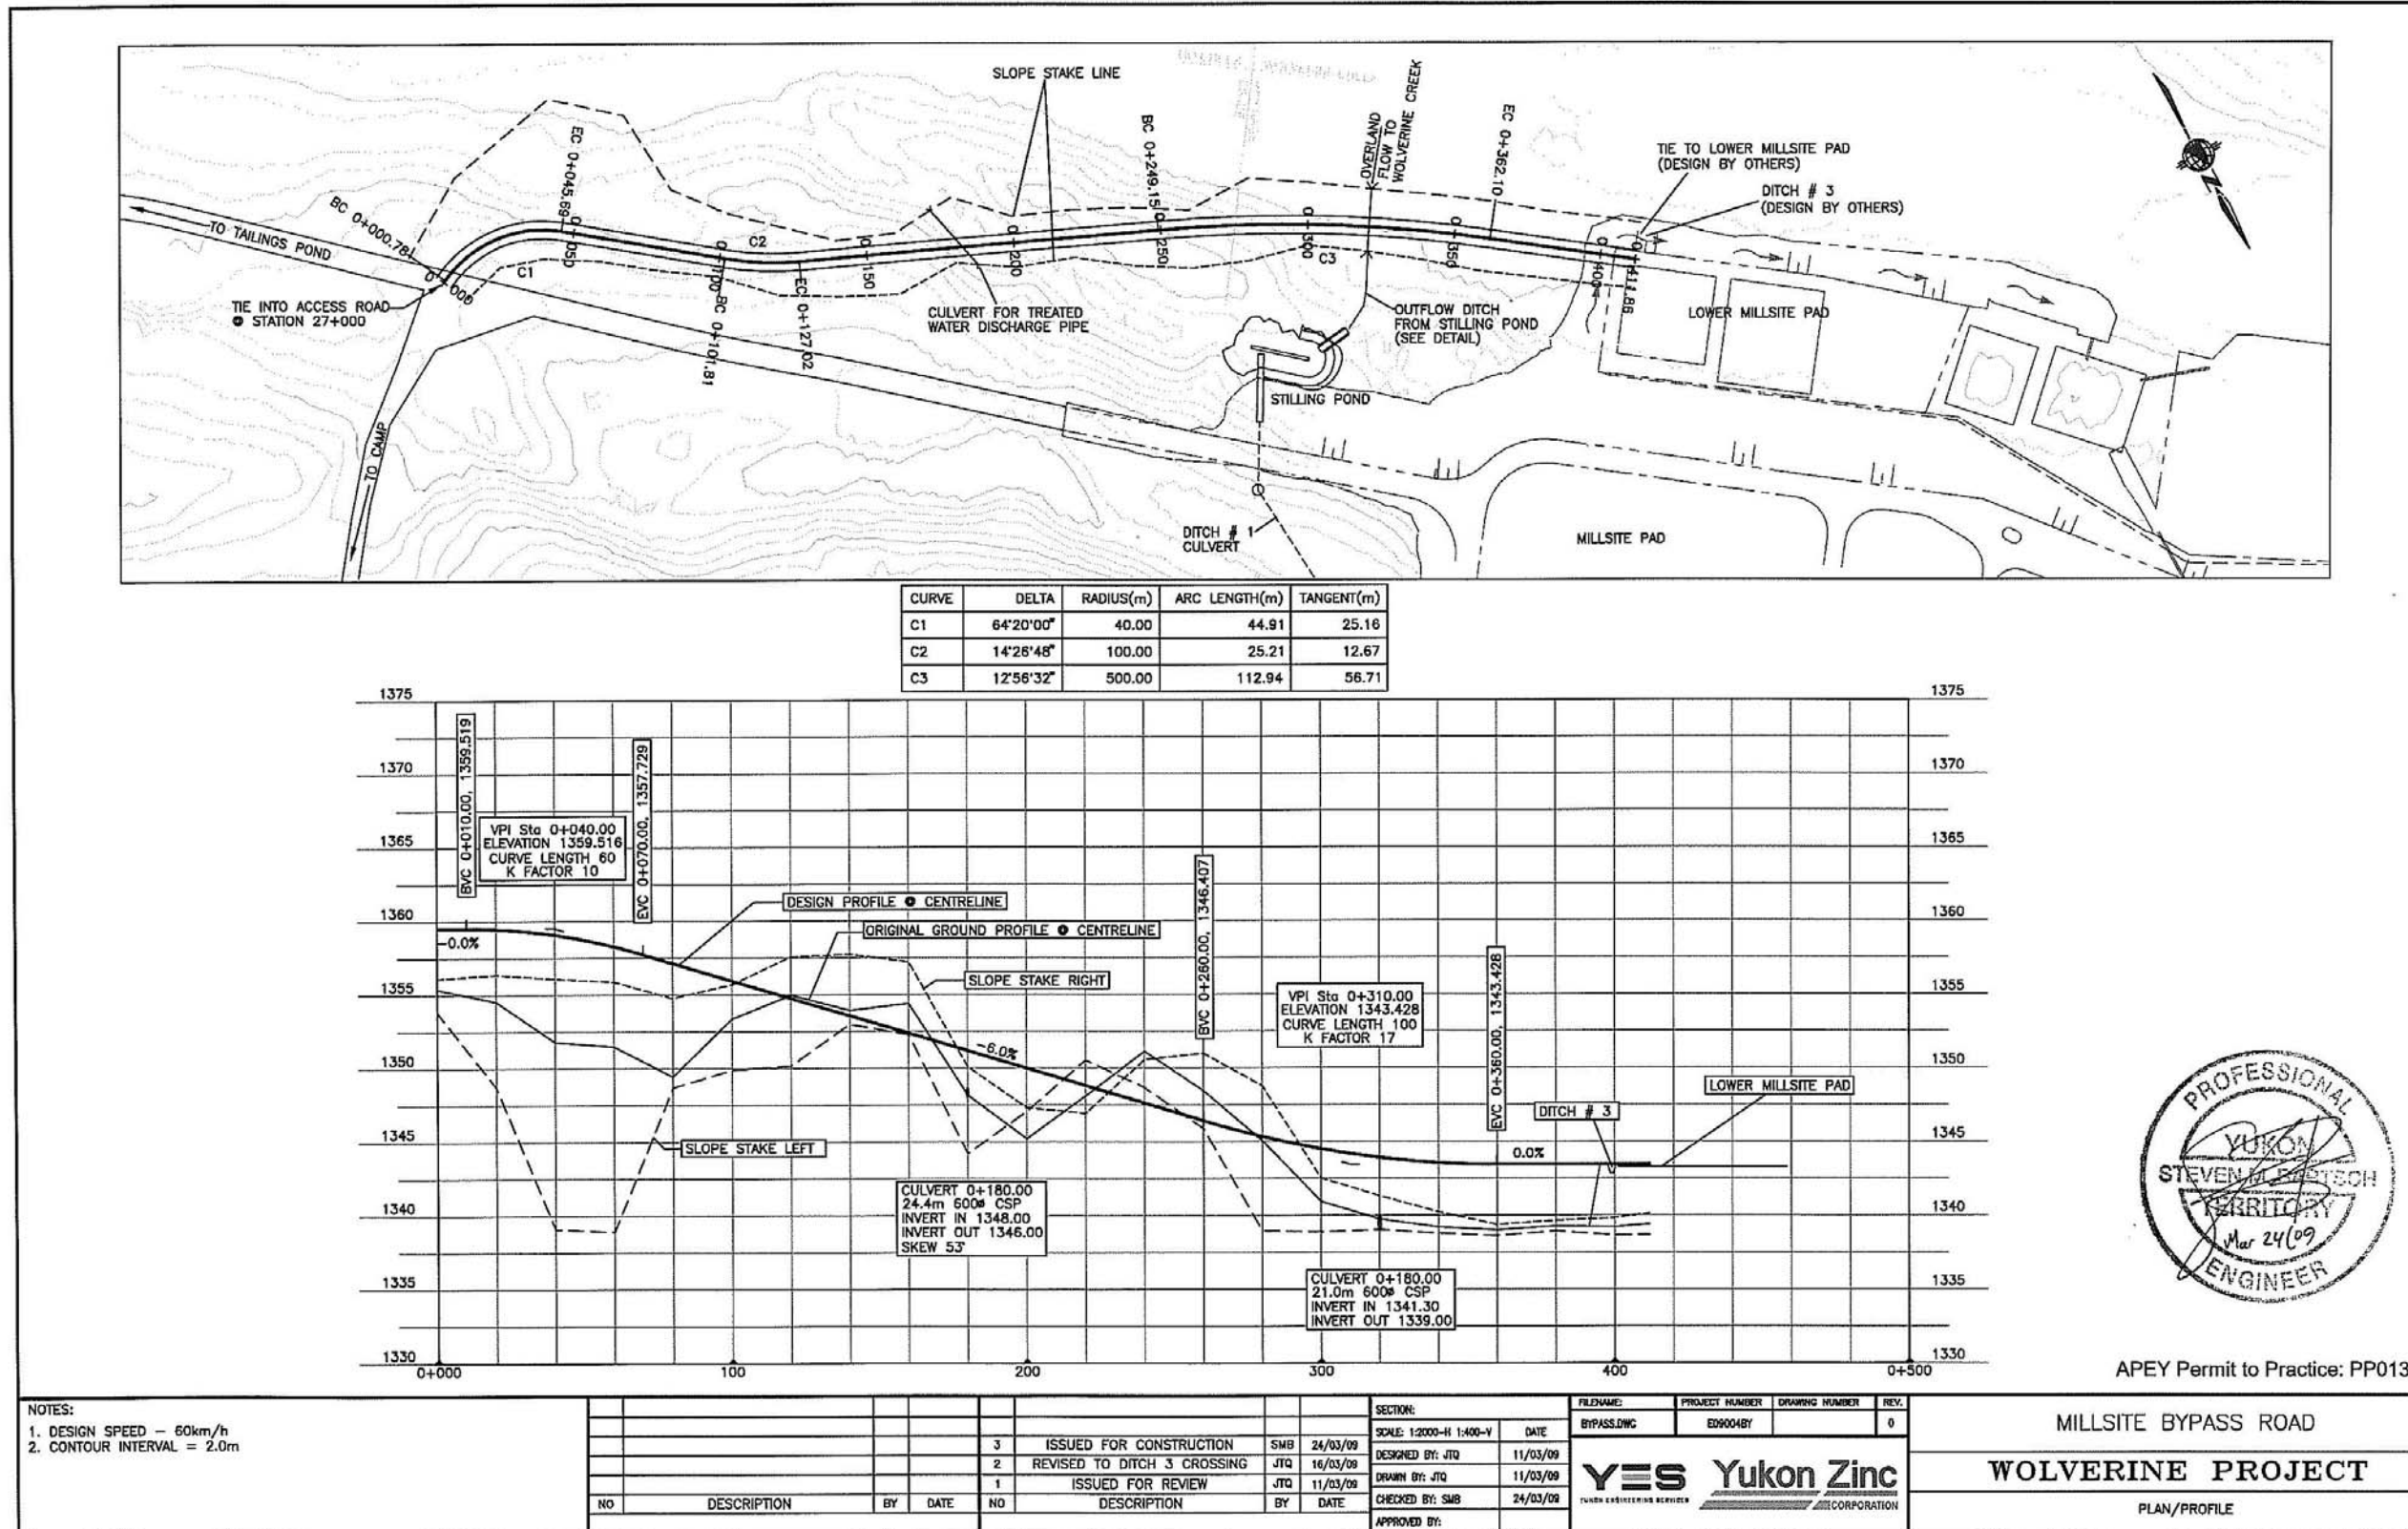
Mill Bypass Road Issued for Construction Drawing - Yukon Engineering Services
